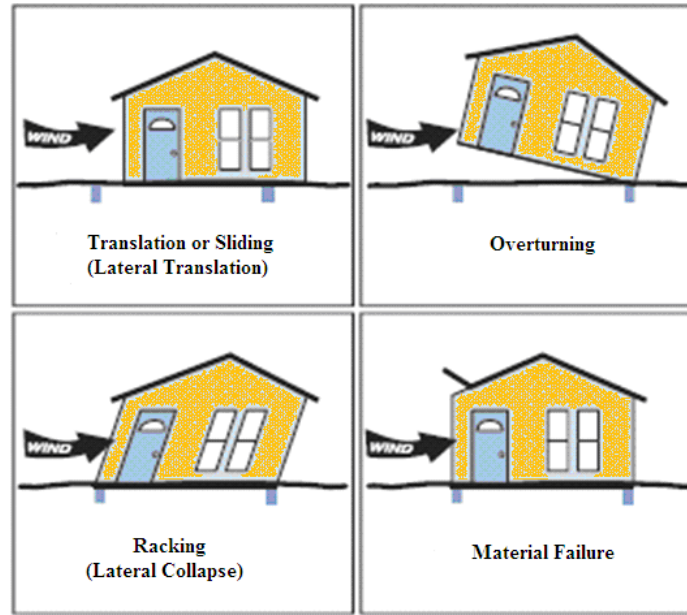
Building Failure Modes Due to Wind Moving Around a Building [1].
